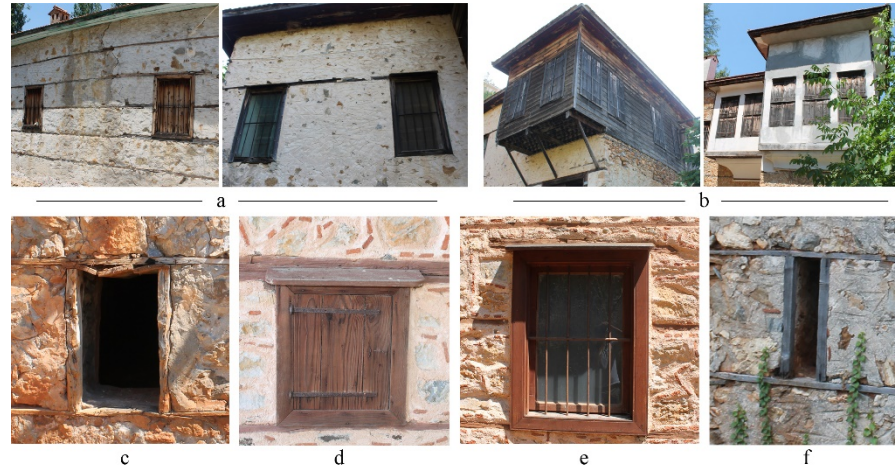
Summer-winter spaces and service floor windows in Alanya rural dwellings.
